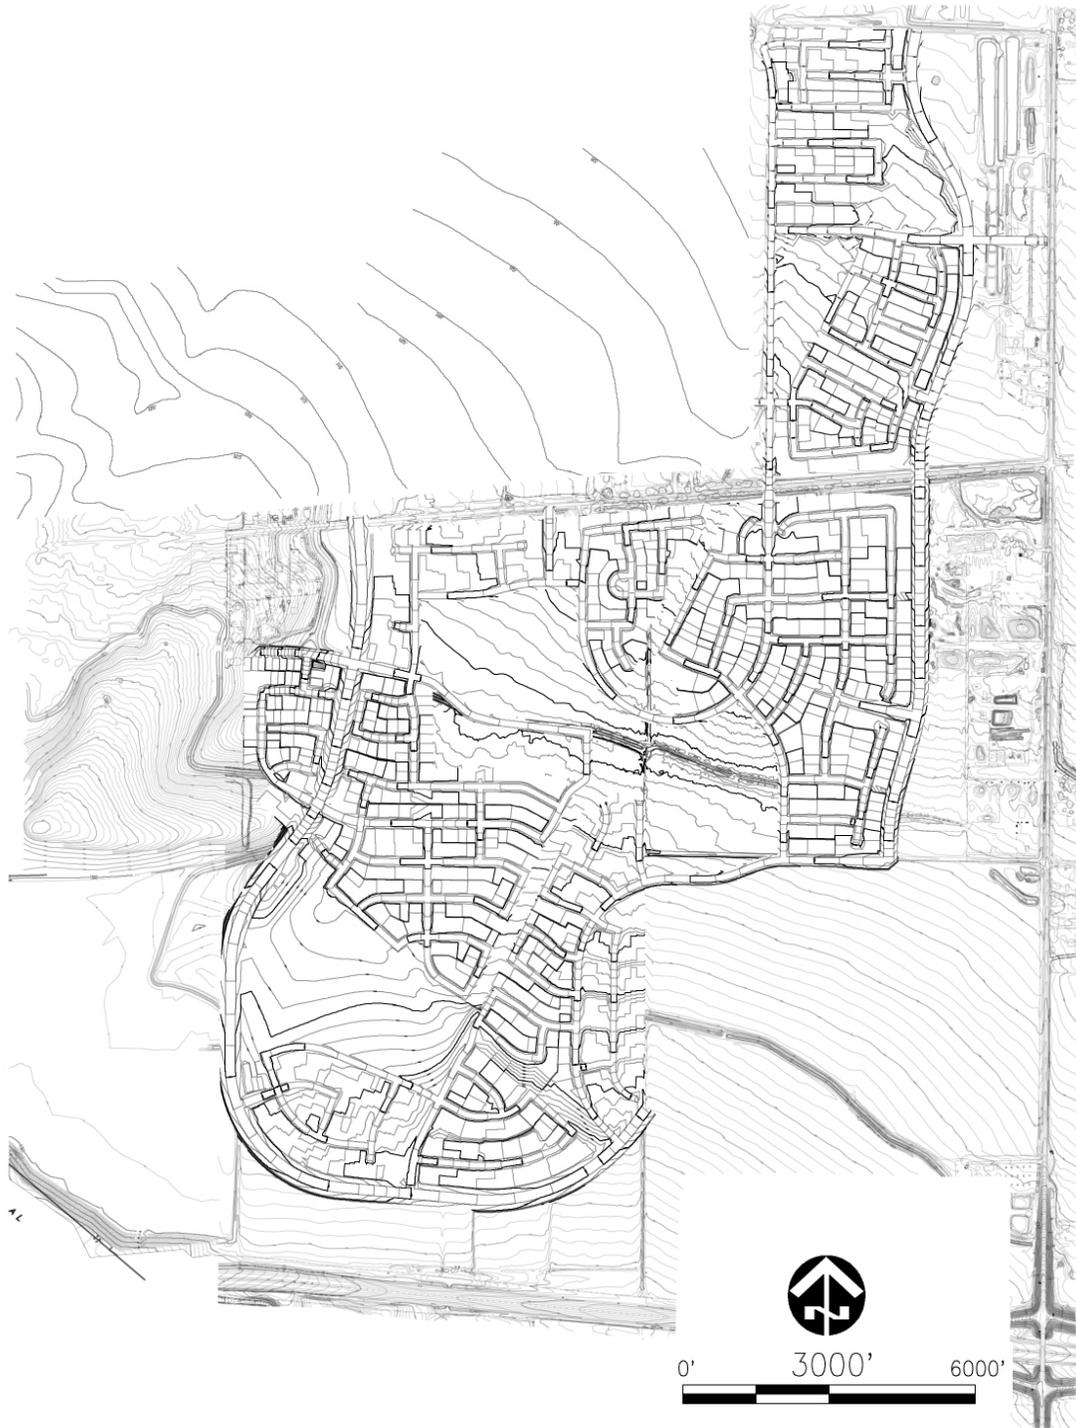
CONCEPTUAL GRADING PLAN
